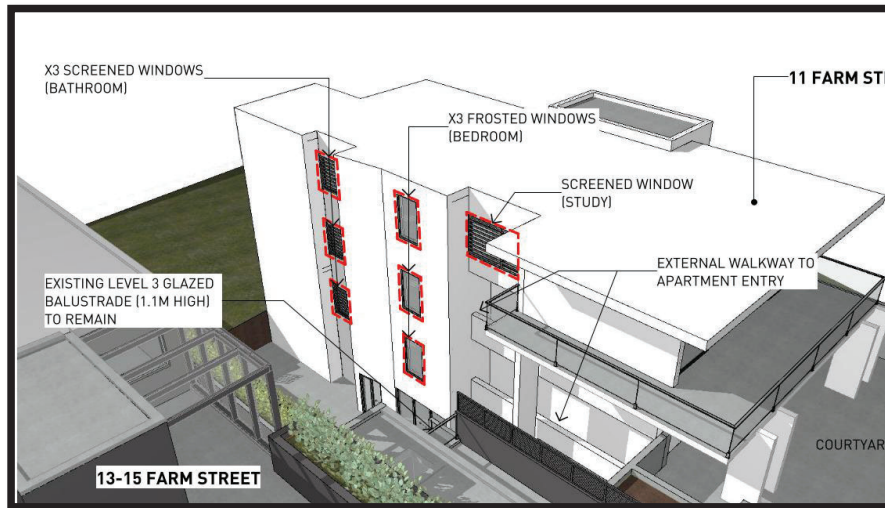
Western elevation of 11 Farm Street, facing the subject site.
